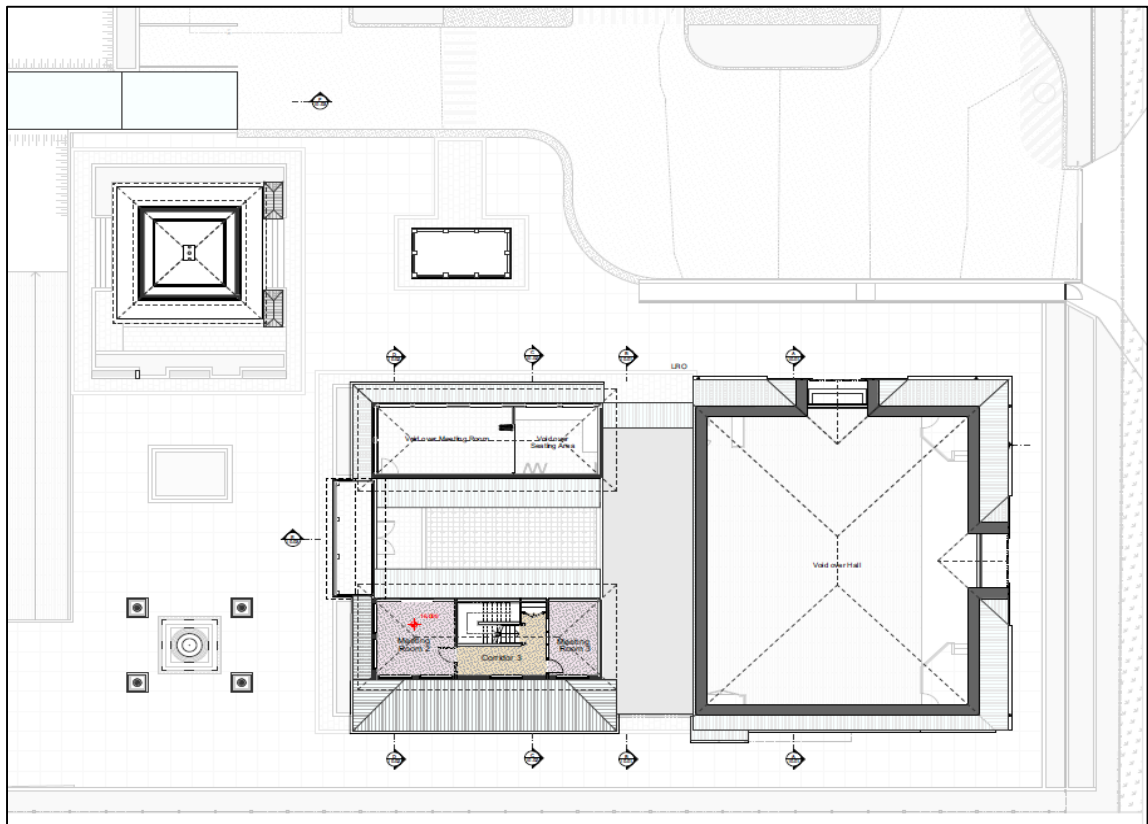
Proposed Plan of Development – Logan Reserve Road Streetscape Elevation
